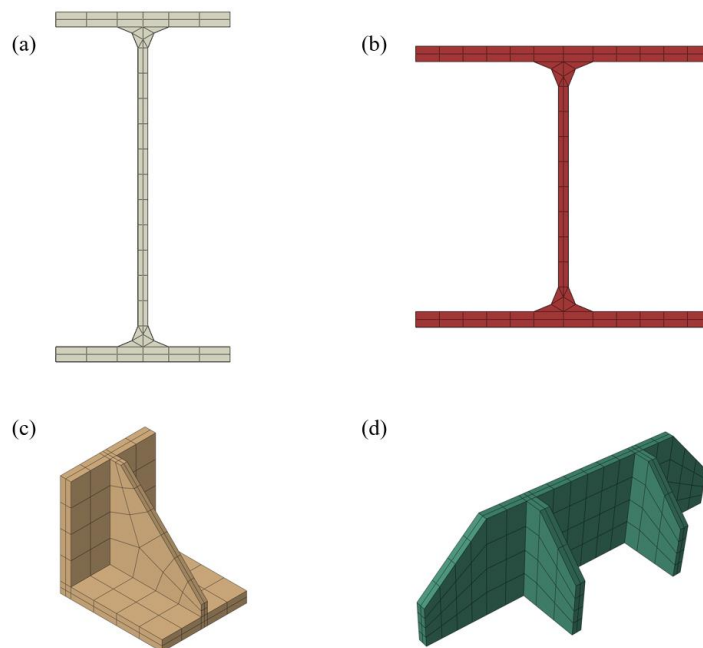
Mesh detail: (a) beam; (b) column; (c) stiffener; (d) base stiffener
